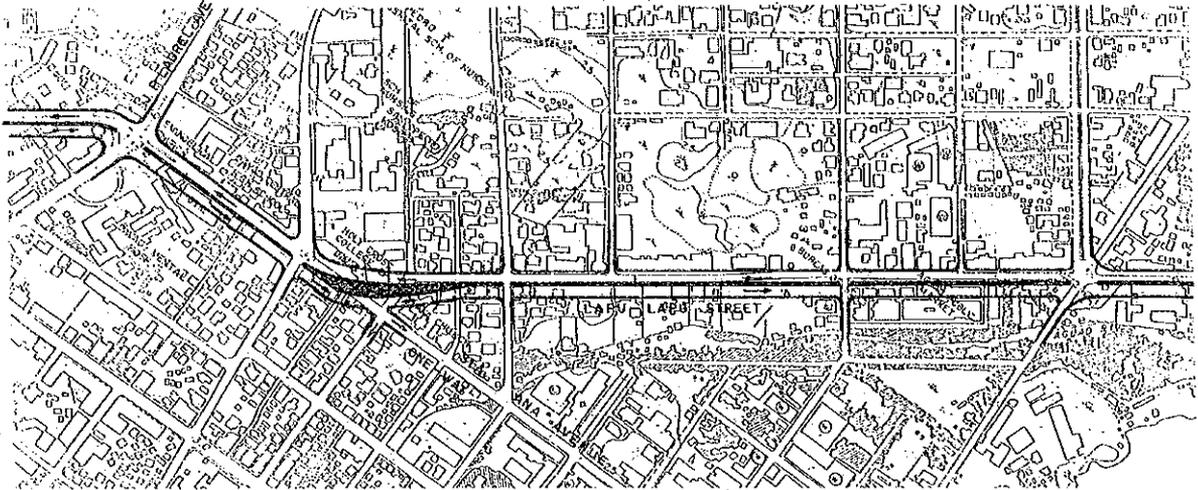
Planned Route (6-lane Road: Sta. Ana Ave.—Lapu-Lapu St. Section)
